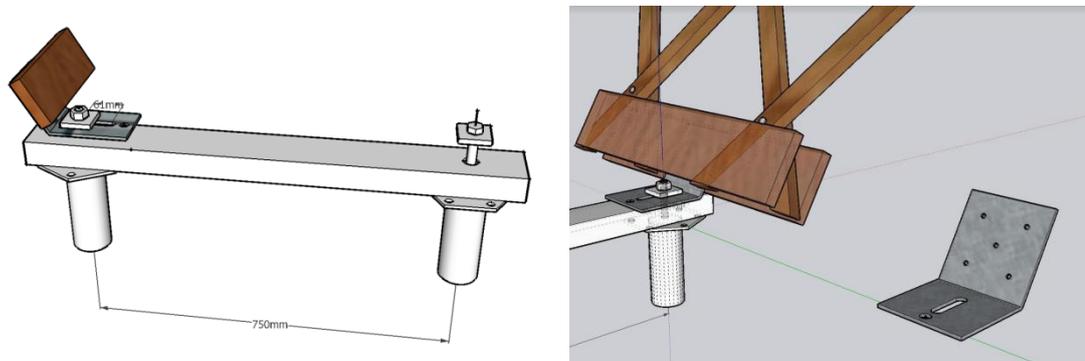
Foundation anchoring design, Matrix pavilion, Třebešov [by author 3/2016]
